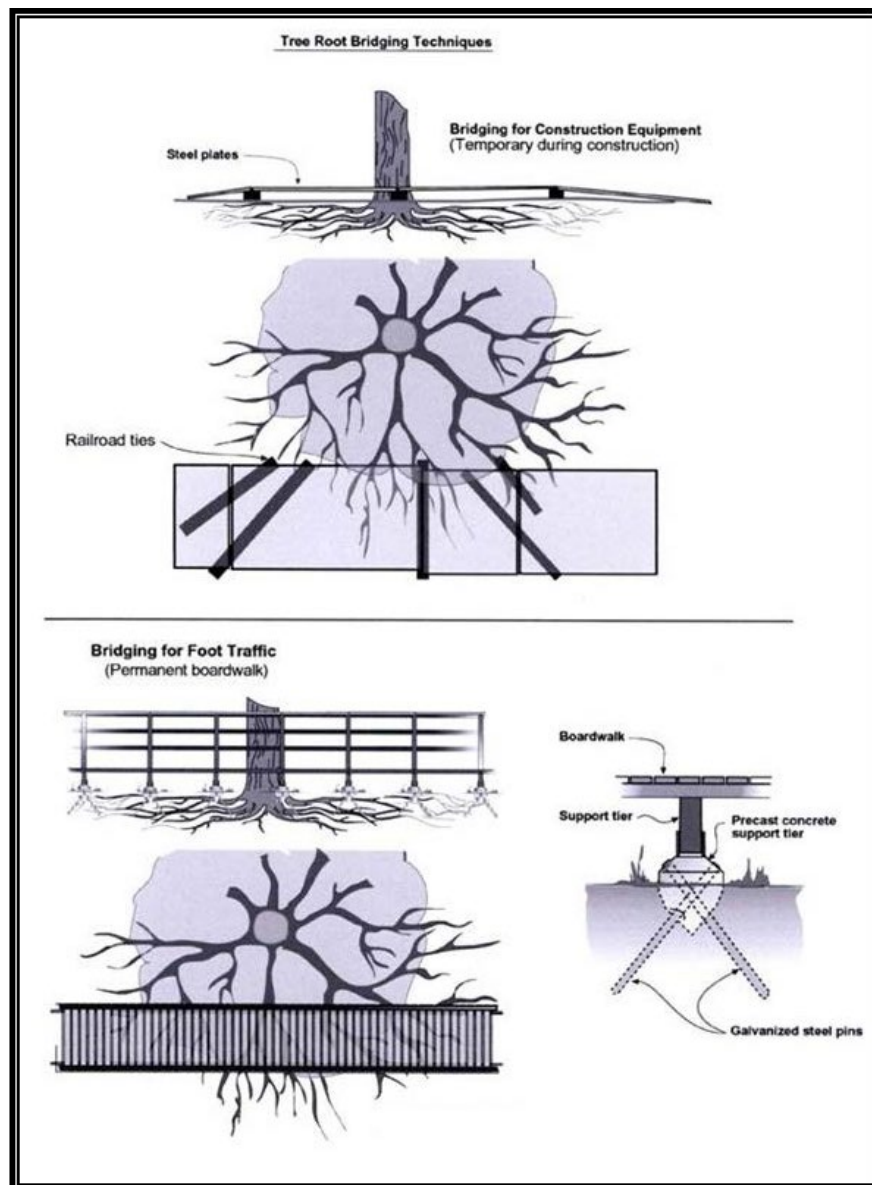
Root Bridge, Source: Pierce County Stormwater Management Manual
